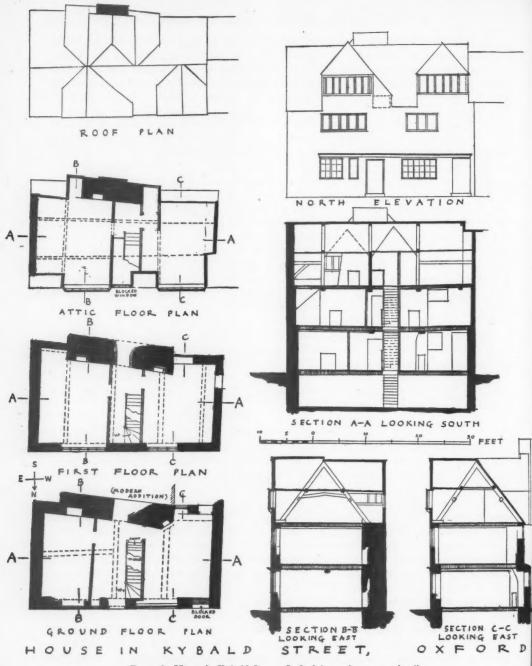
House in Kybald Street, Oxford (stone house: c. 1600?).
